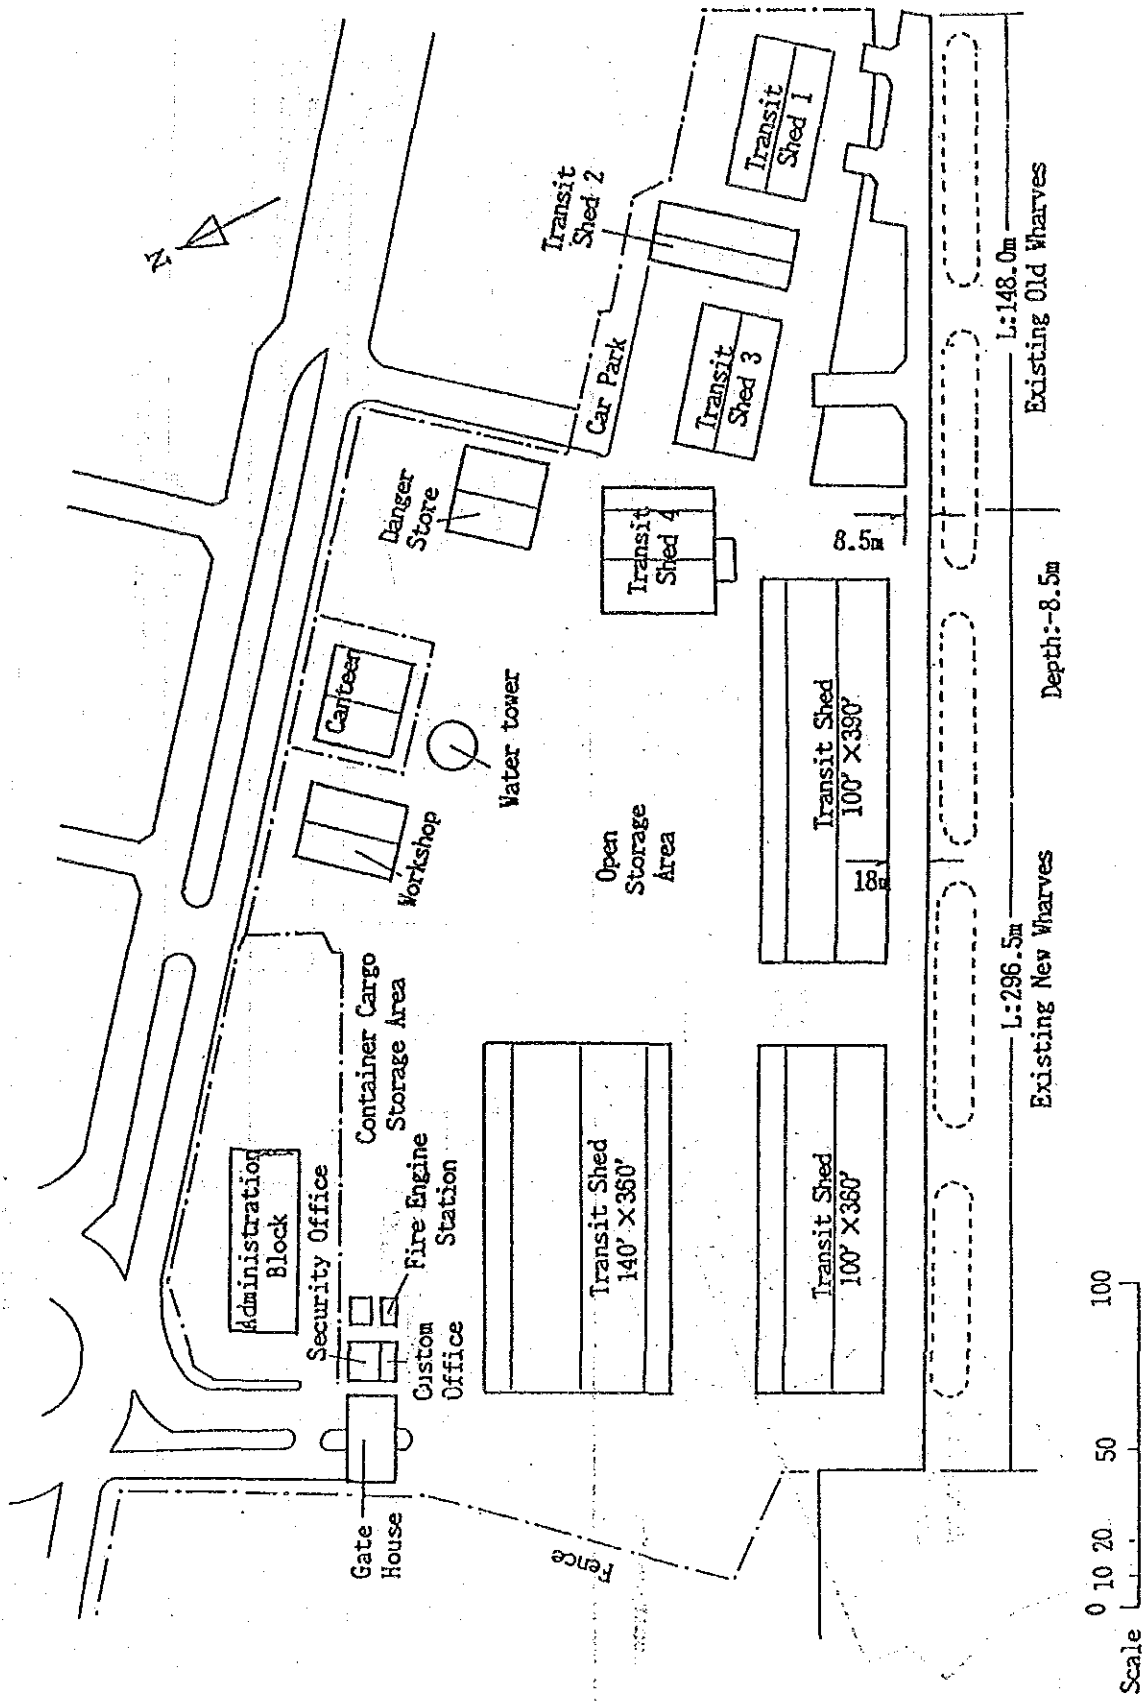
Layout of Existing Rajang Port at Sibe Center
